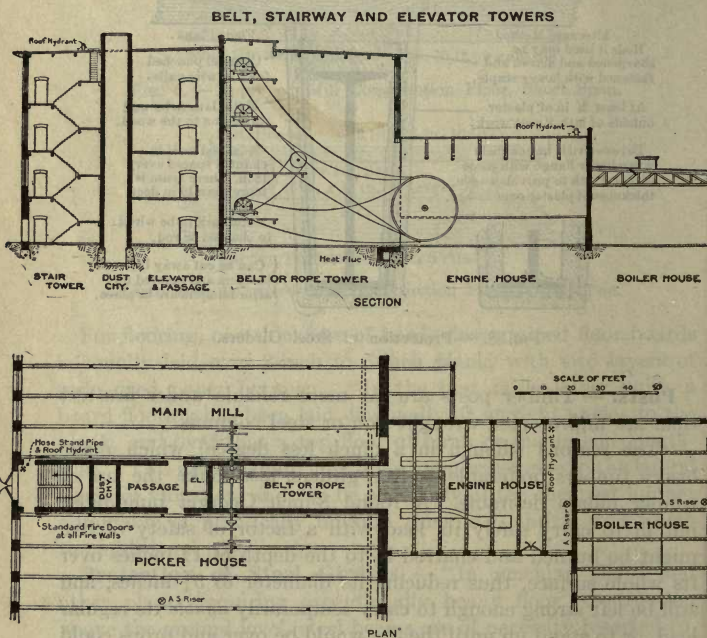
Typical Arrangement of Belts, Stairway and Elevator.
